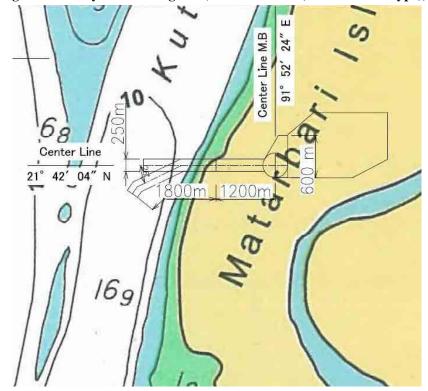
Layout Planning A-2 (Matarbari Site (Excavated Type))
